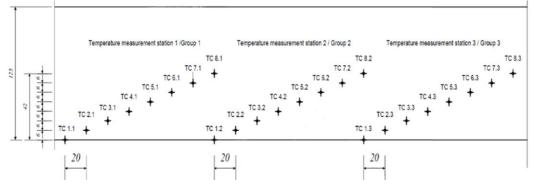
Side elevation of the instrumented beam, dimensions in mm
